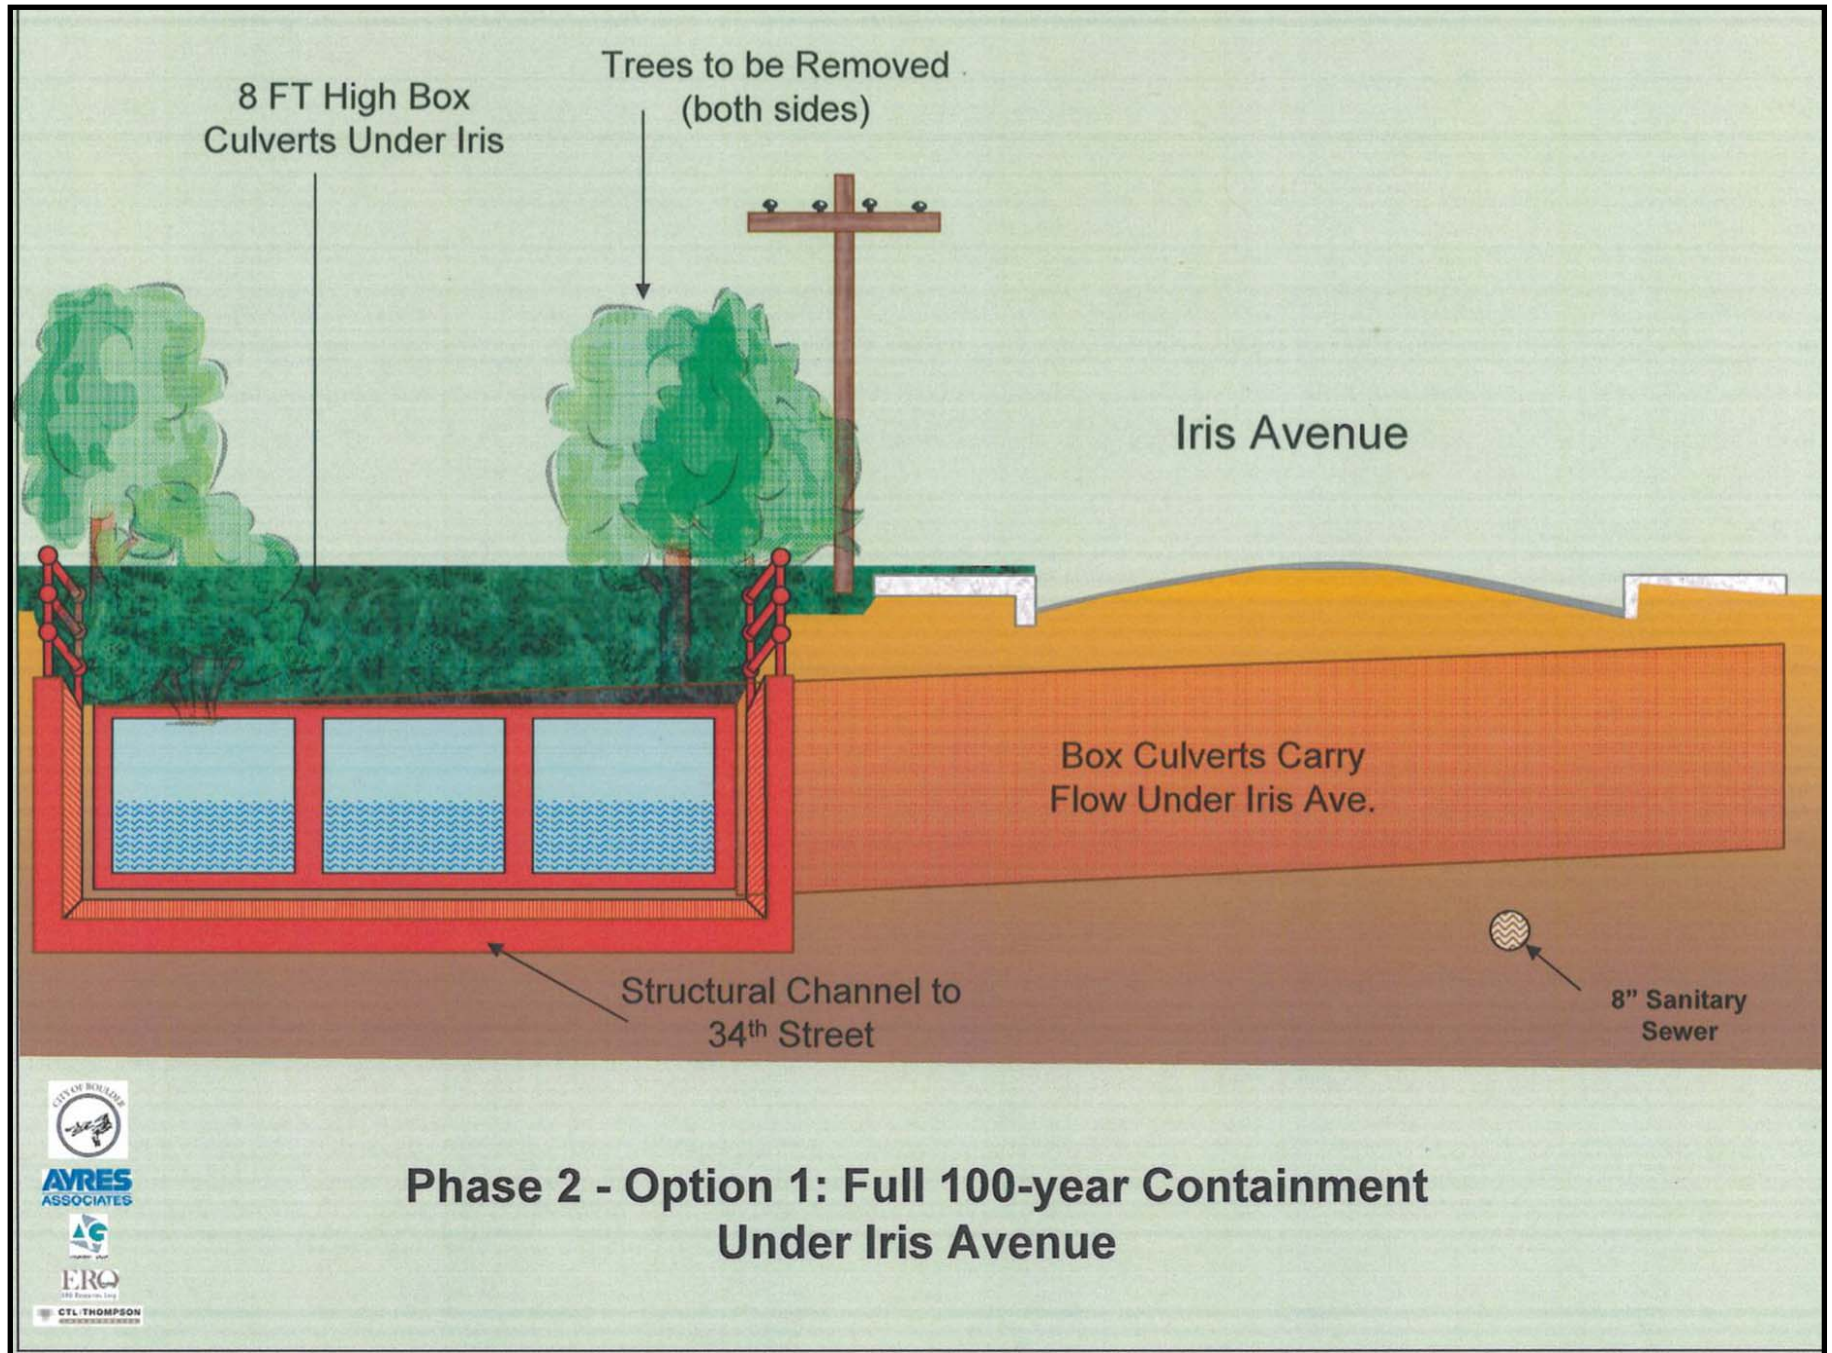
Phase II Flood Mitigation Alternative – Multi-Cell Culvert under Iris and Concrete Channel Cross Section
